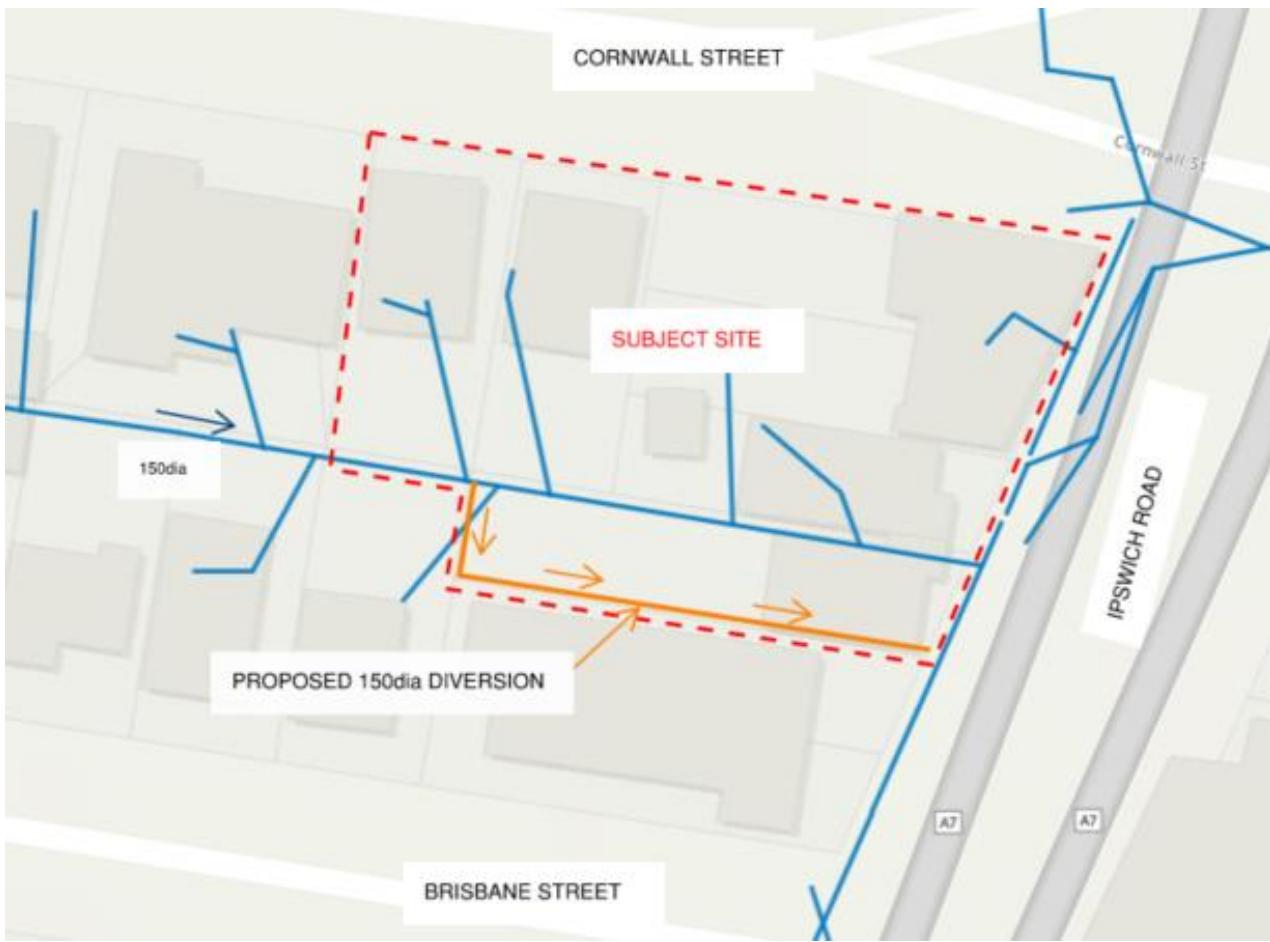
BCC Stormwater Pipe – Existing & Proposed Realignment
